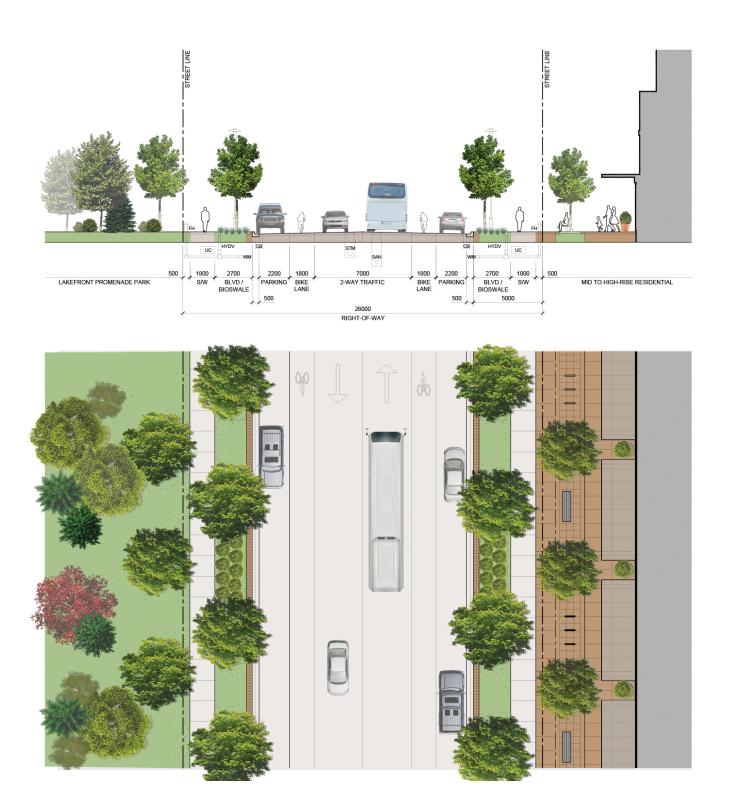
E At grade level residential-use facing a park on 'A' street frontage (Aviator Avenue).
